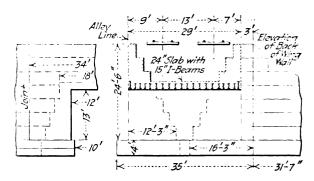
SMALL SUBWAY UNDER TRACK ELEVATION AT 78TH ST.
